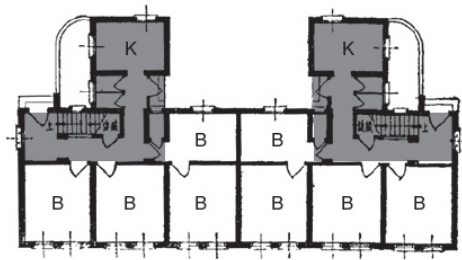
Typical floor plan in Caoyang New Village (Source: Wang, 1956)
